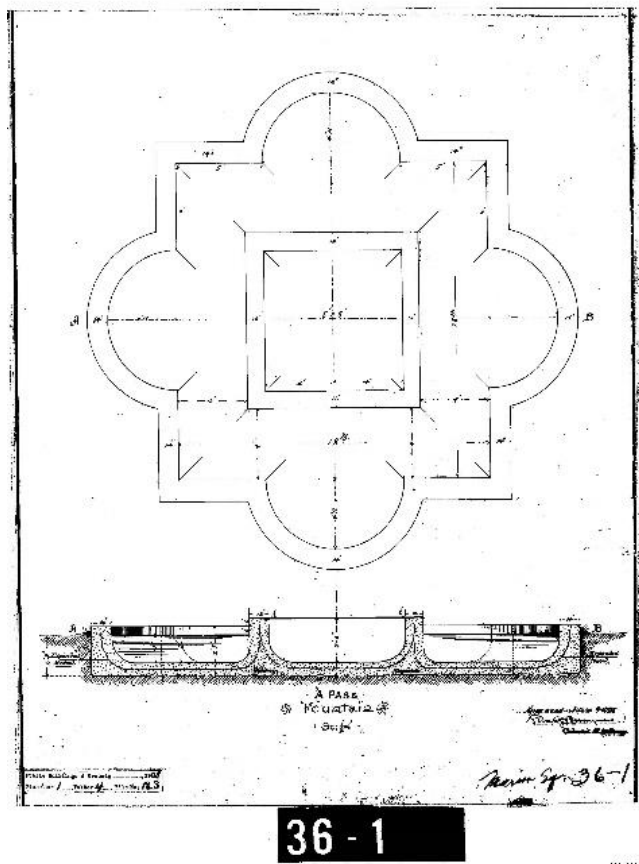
1905 Plan and section drawings of the fountain installed in Marion Park. (“Marion Park Proposed Fountain,” TIC 823/80001, NCA)
